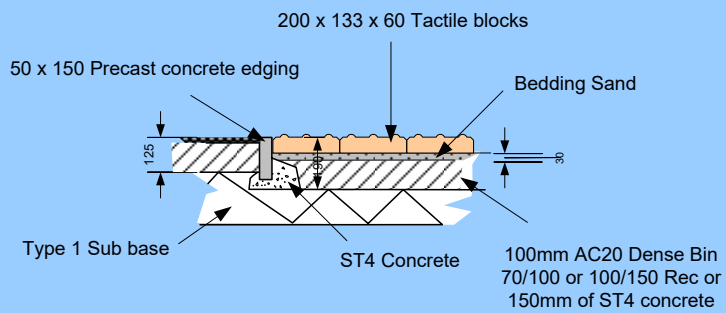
/8 TACTILE PAVING – TYPICAL DETAIL
